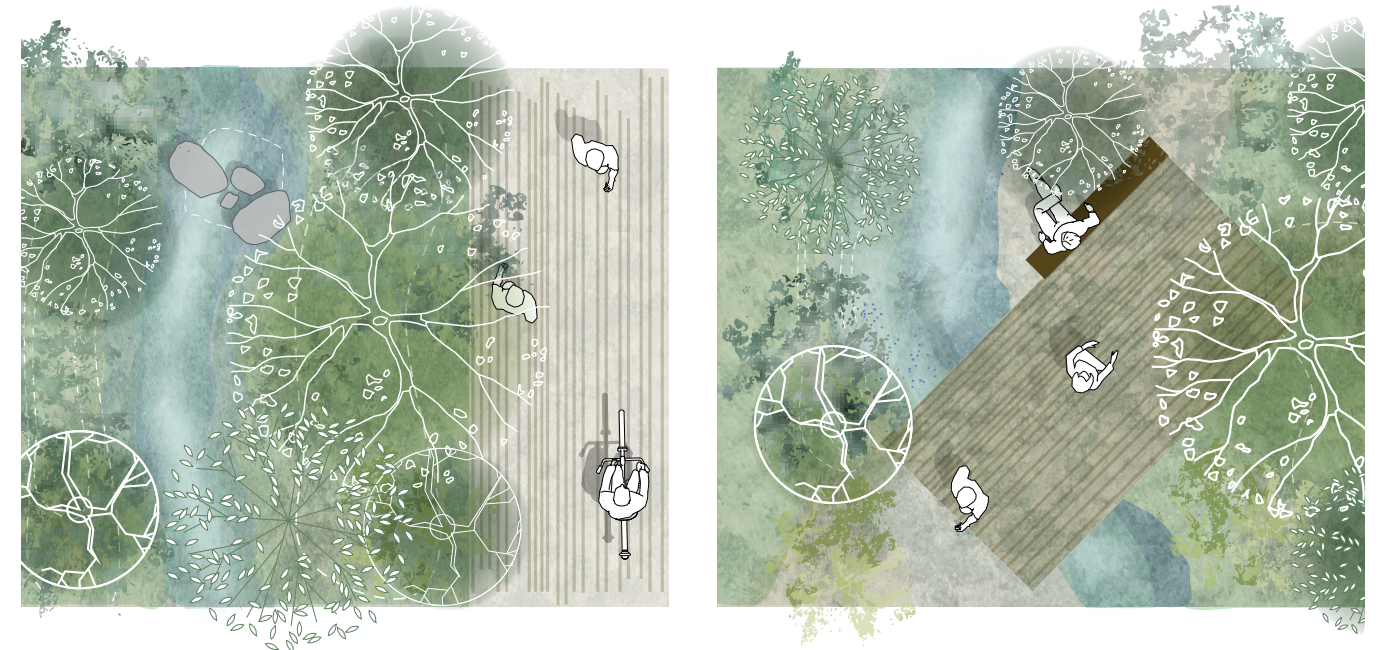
Typical conceptual sections and plan views of the Bio Corridor at 3.0 metre and 8.0 metre widths.
